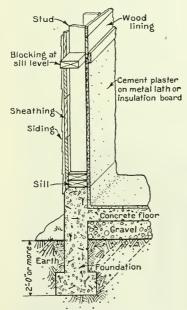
Recommended construction of walls and floors of new frame barns. Cement plaster on metal lath or insulating board is applied to the inside of the studs at least to the level of the window sills as a better protection against rats and as being more easily kept clean than wooden lining
